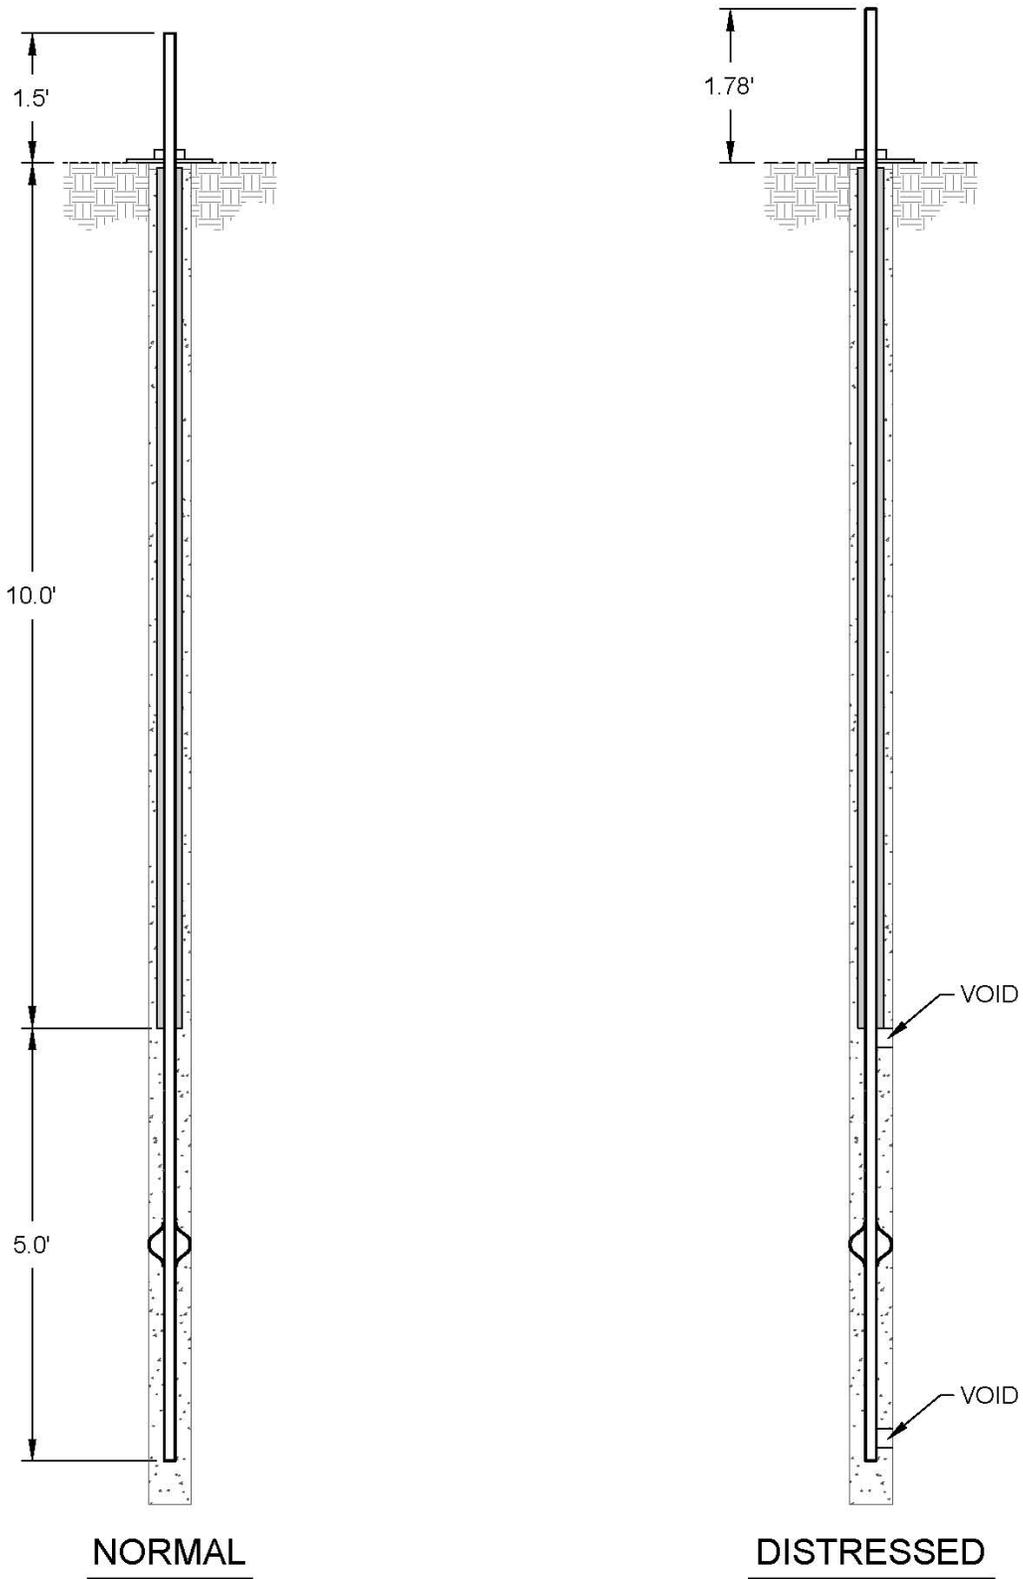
(b) Sketch of 15' long dummy rock bolt installations.
